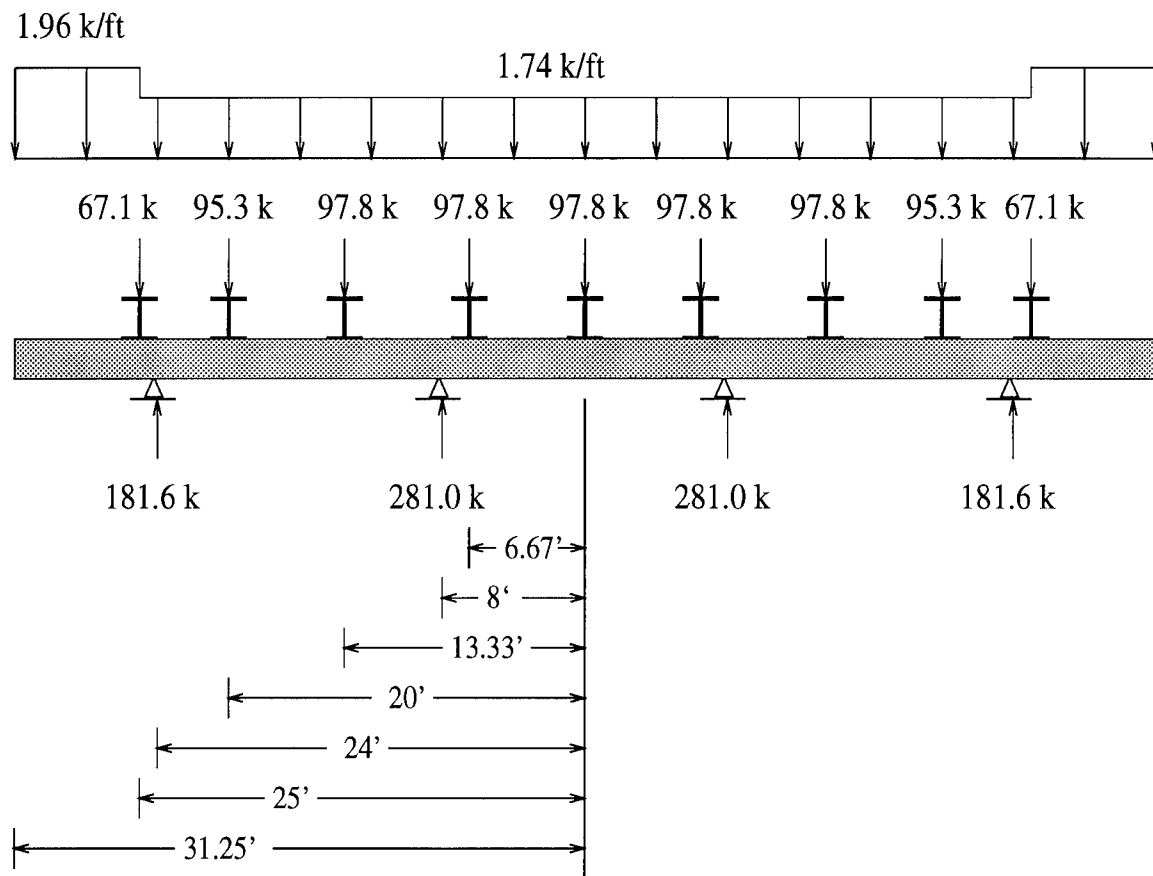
Critical Loading Condition on Pier Cap Modeled as an Indeterminate Beam
